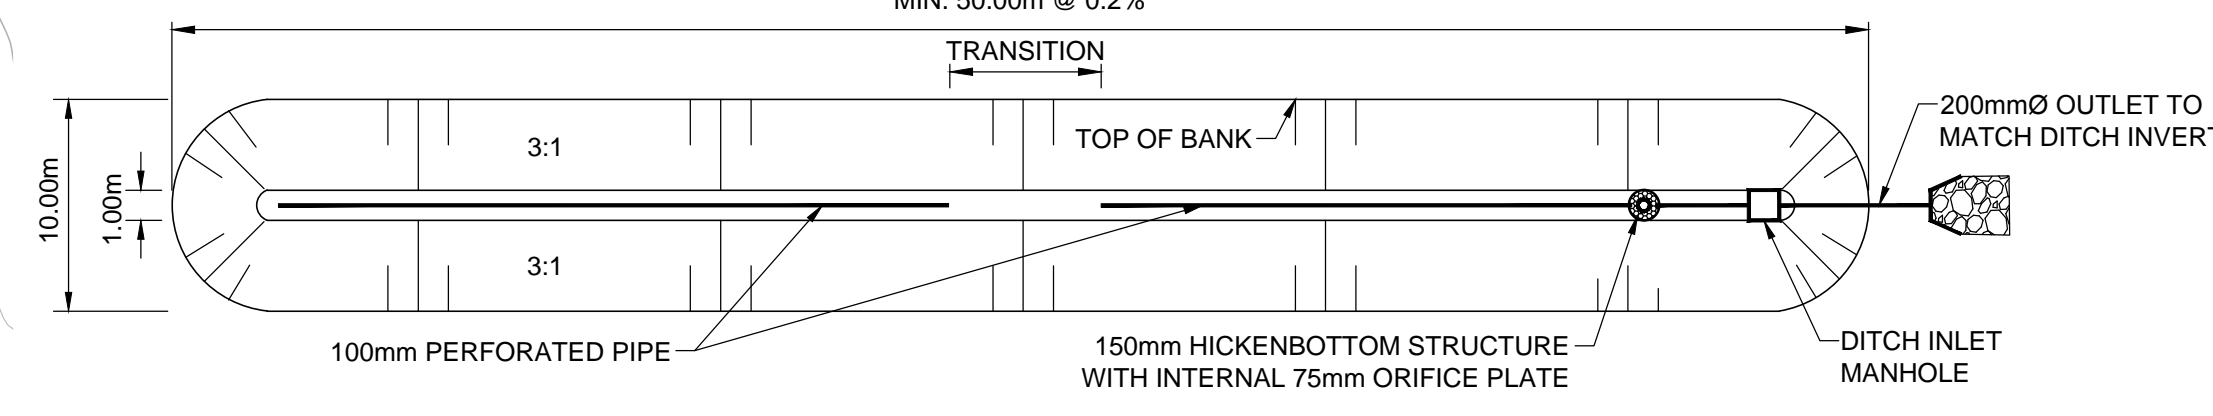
HICKENBOTTOM DRAIN DETAIL
